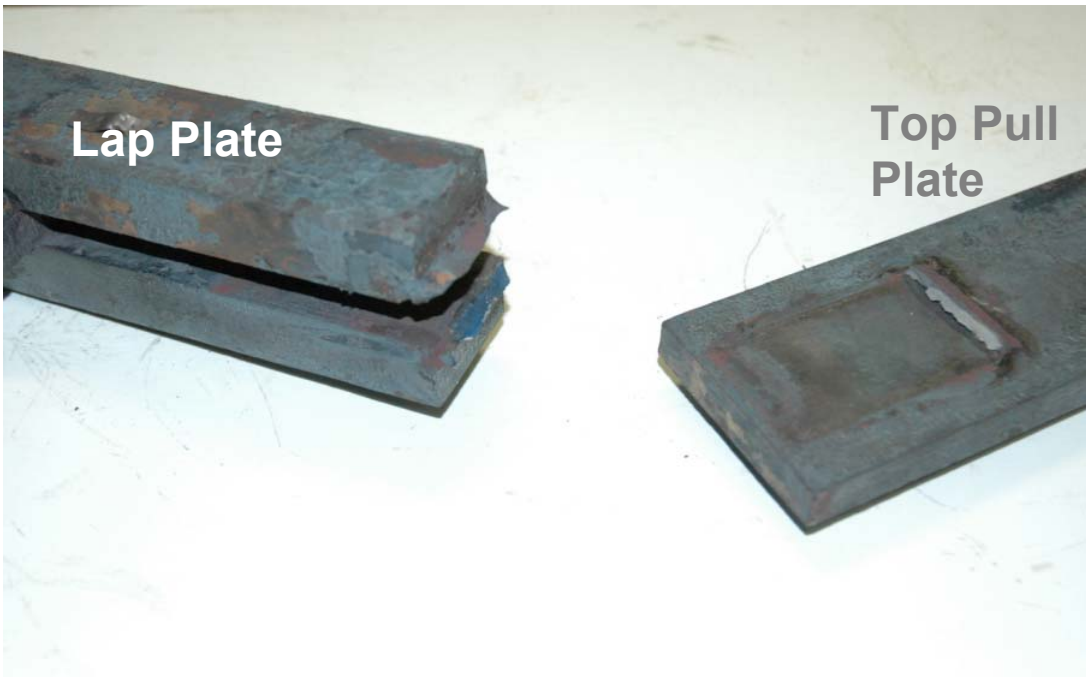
Photograph of Specimen P1 after fracture, where the weld on the lap plate and top base plate is visible
